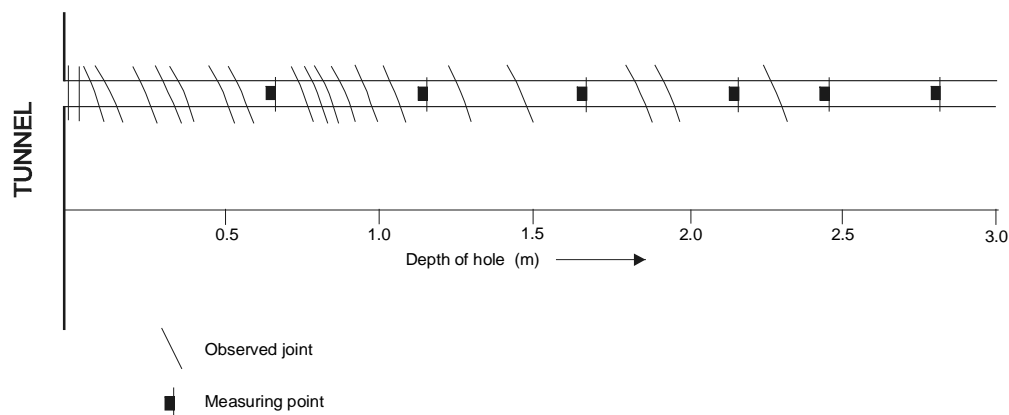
Registration of relief joints in a core drill hole outward from the upper part of the wall. Most joints have been developed within 2.5 m from the tunnel surface (from SINTEF, 1990).
